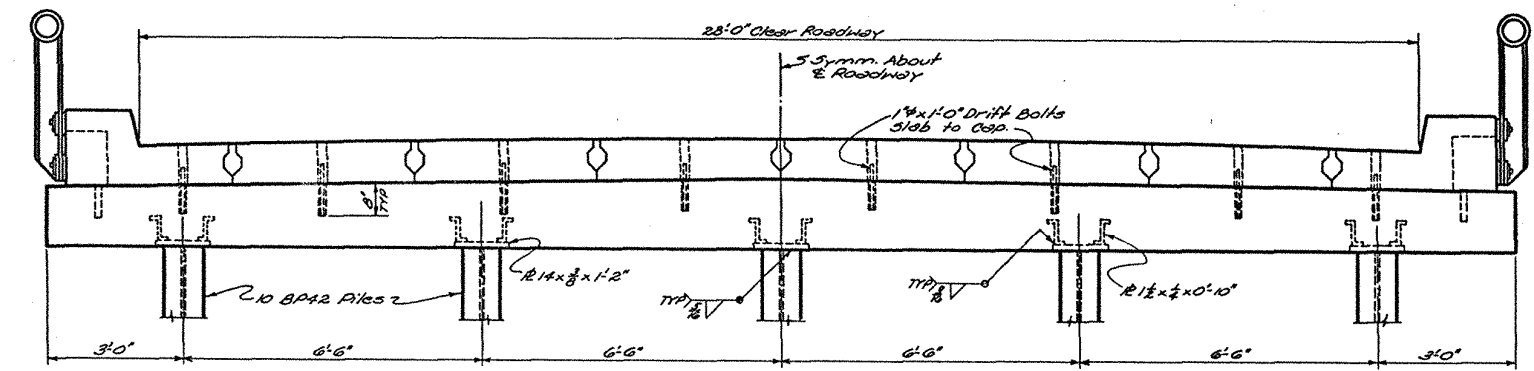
DETAILS SHOWING CONNECTIONS OF STRAPS, PLATE AND PILE
